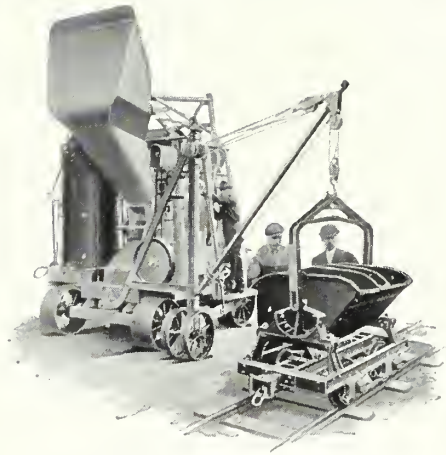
Skip Raised, Car Lowered Onto Running Gear
